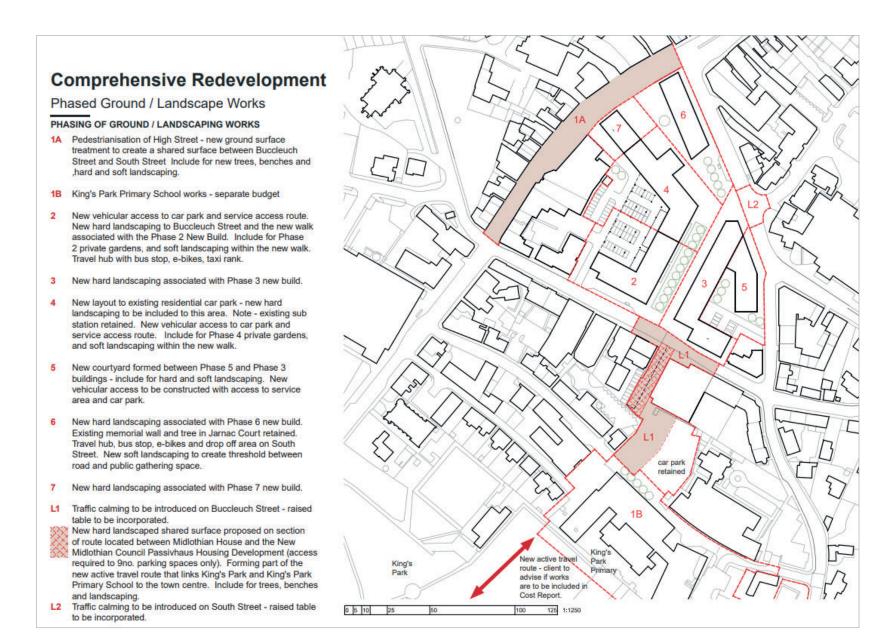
Location plan of traffic calming measures within town centre (© Reich & Hall)
